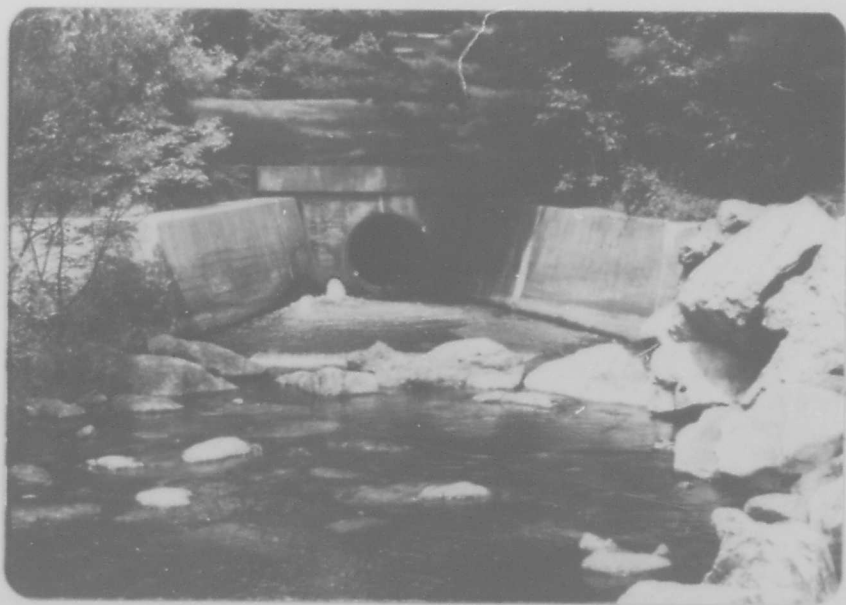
Blow-off discharge point, showing the wingwalls and riprap.
